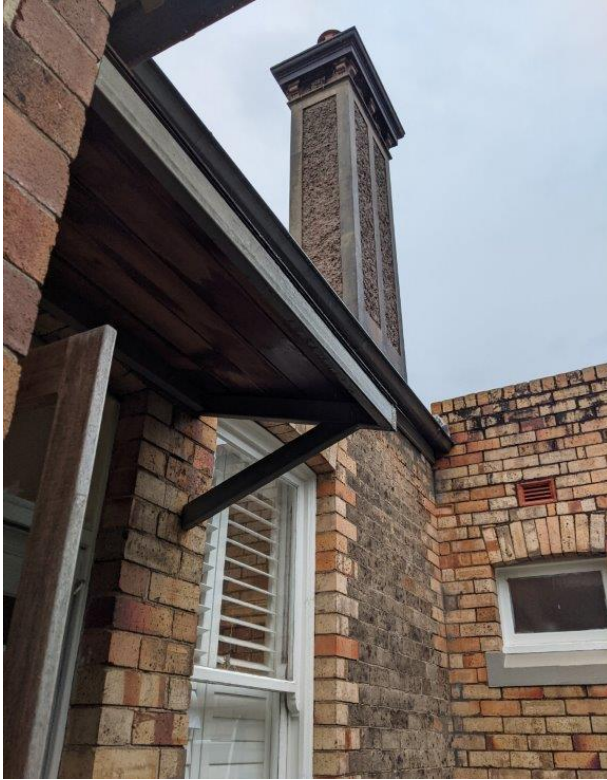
View from the side of the house at the recessed space next to the living room and its fireplace with chimney, looking towards the protruding dining room.
